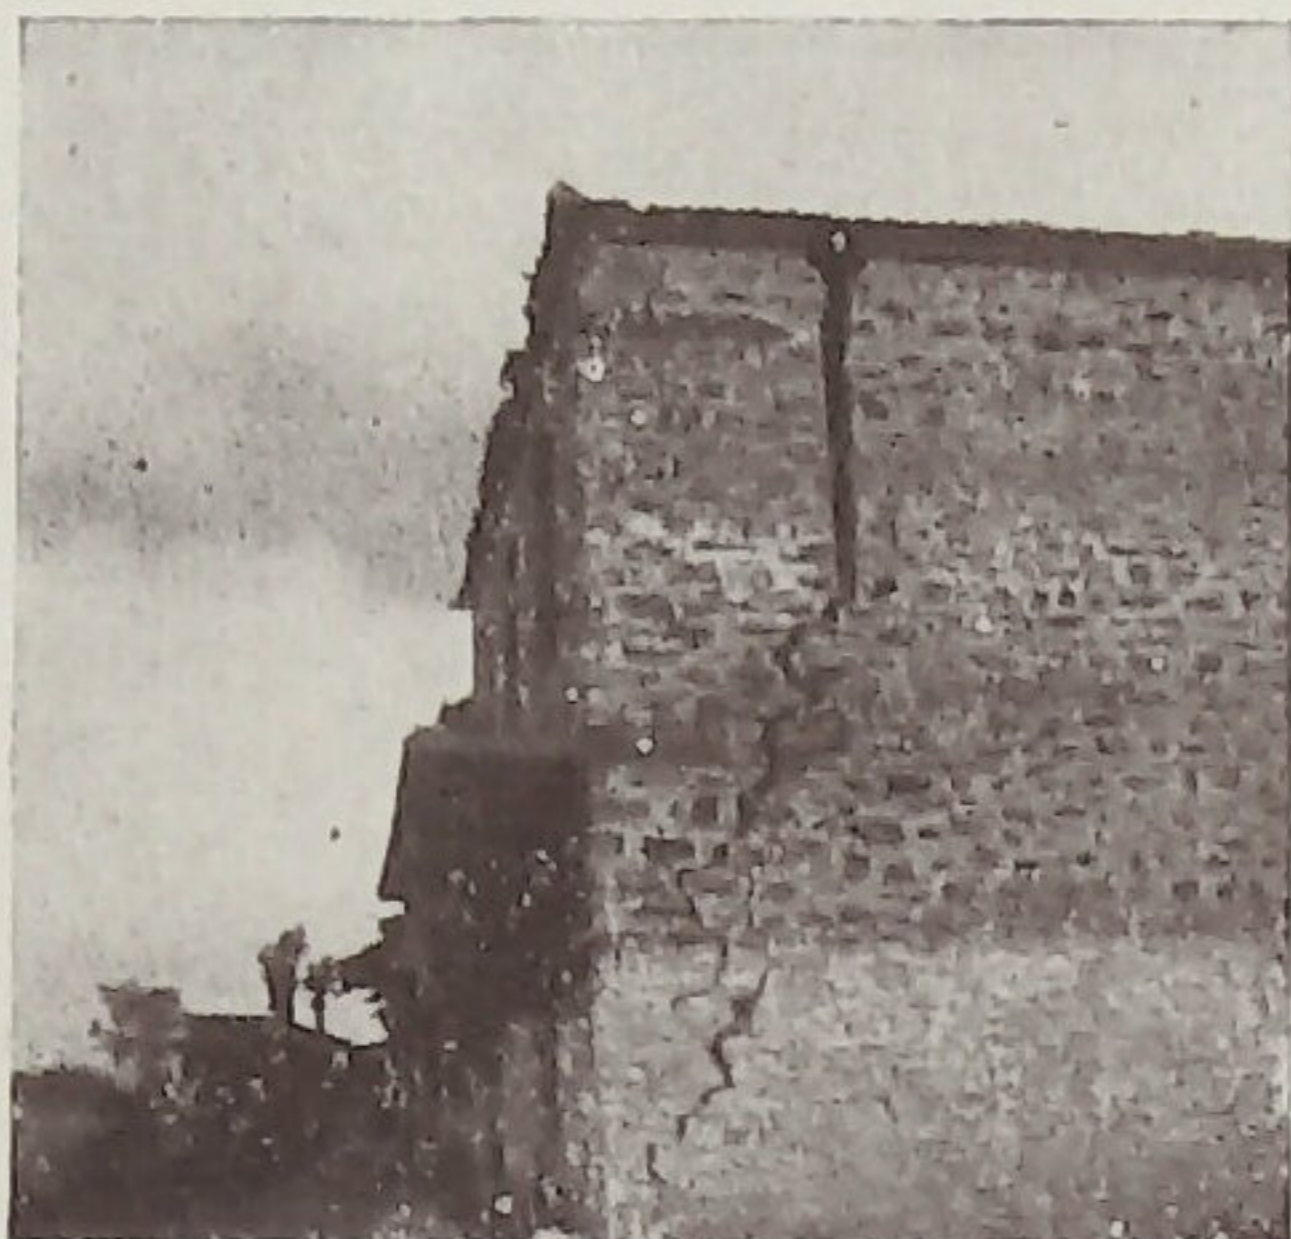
Wall crack to a new stone house near the railway station of Pharsala by the earthquake of April 30, 1954. Note that crack widens as it goes up.
